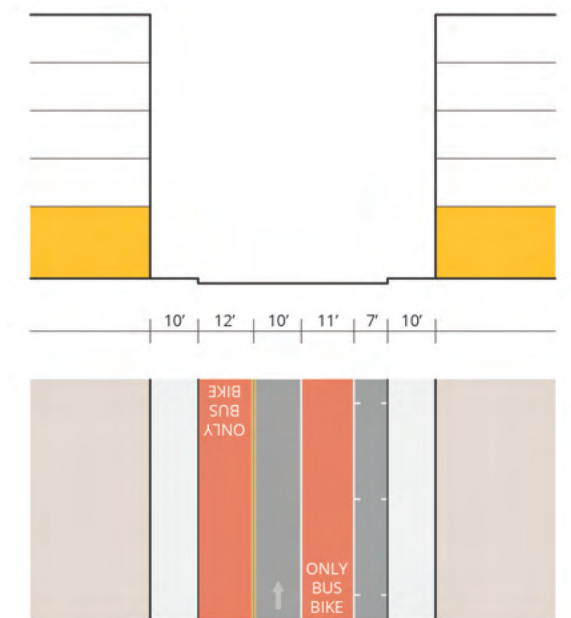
MERIDIAN STREET SOUTH OF SARATOGA STREET - PROPOSED CONDITION
